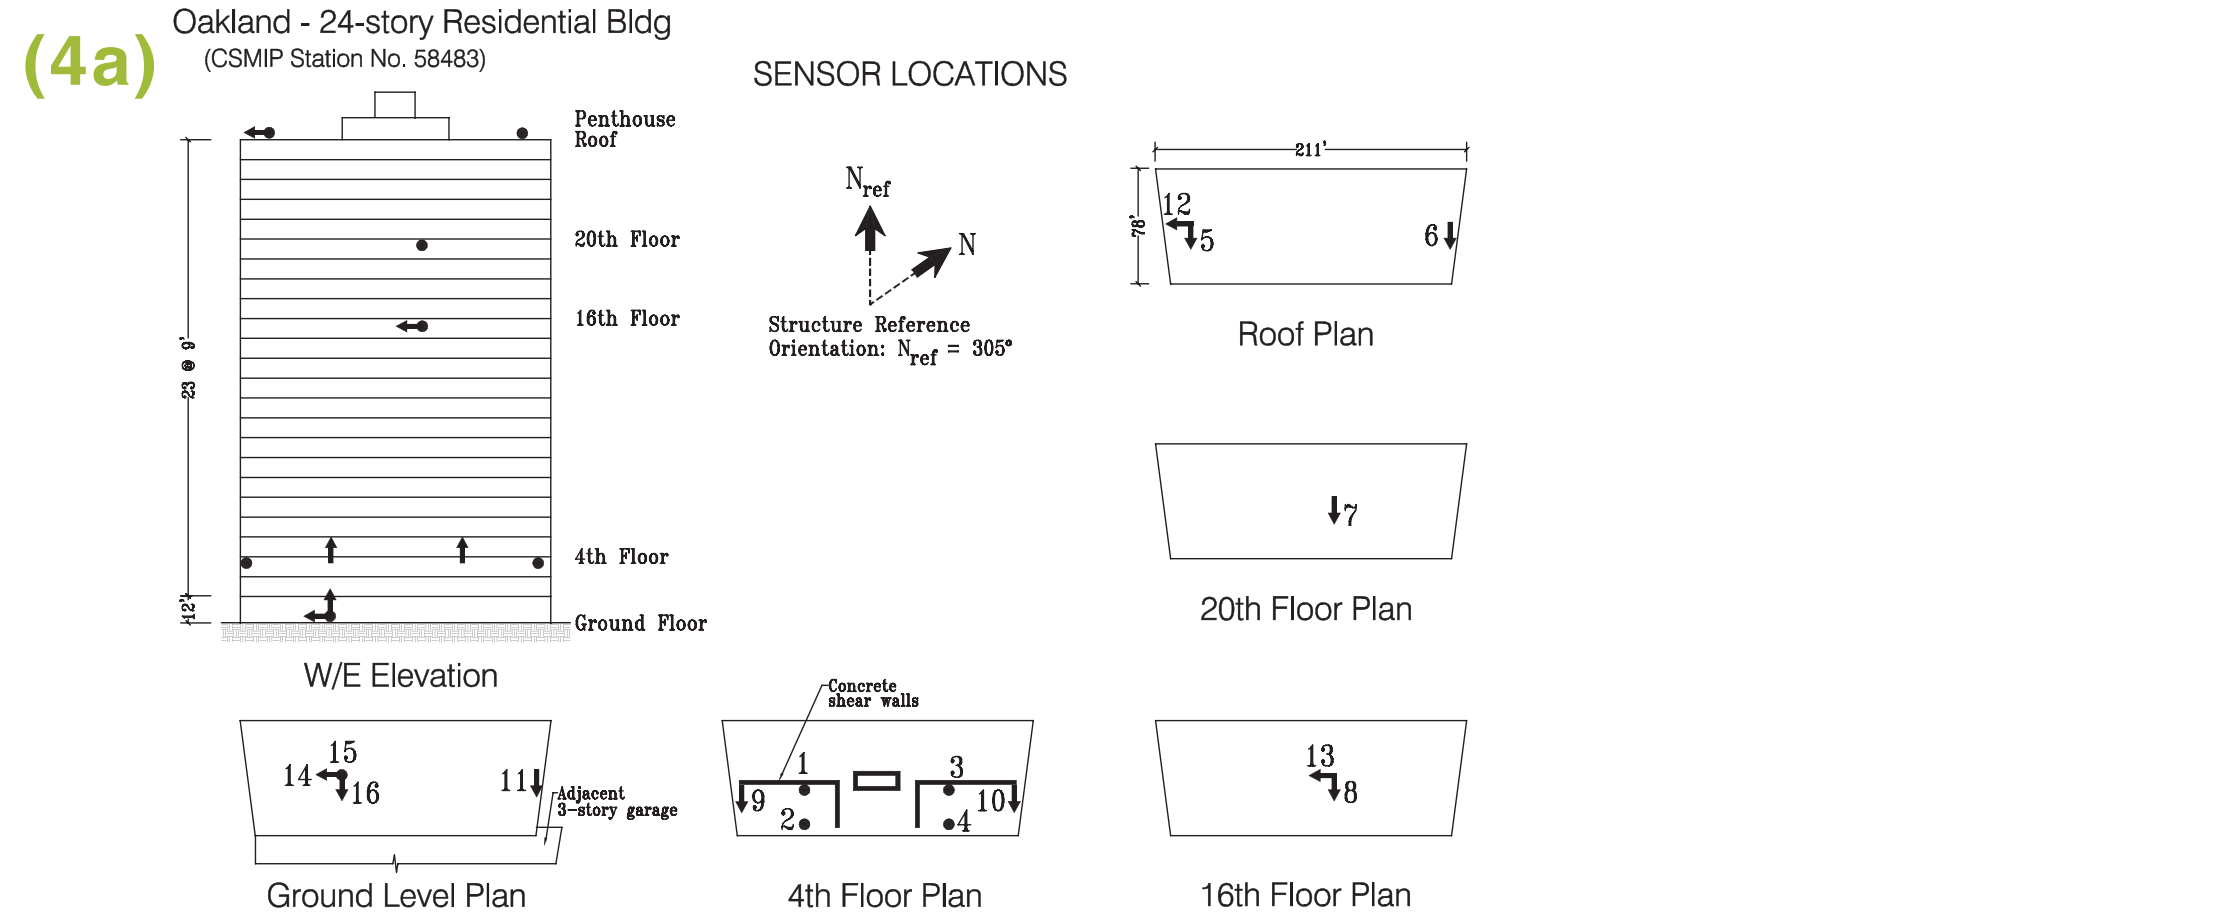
Floor plans for a 24 story residential building in Oakland, CA, with arrows to indicate the location and orientation of installed sensors.
